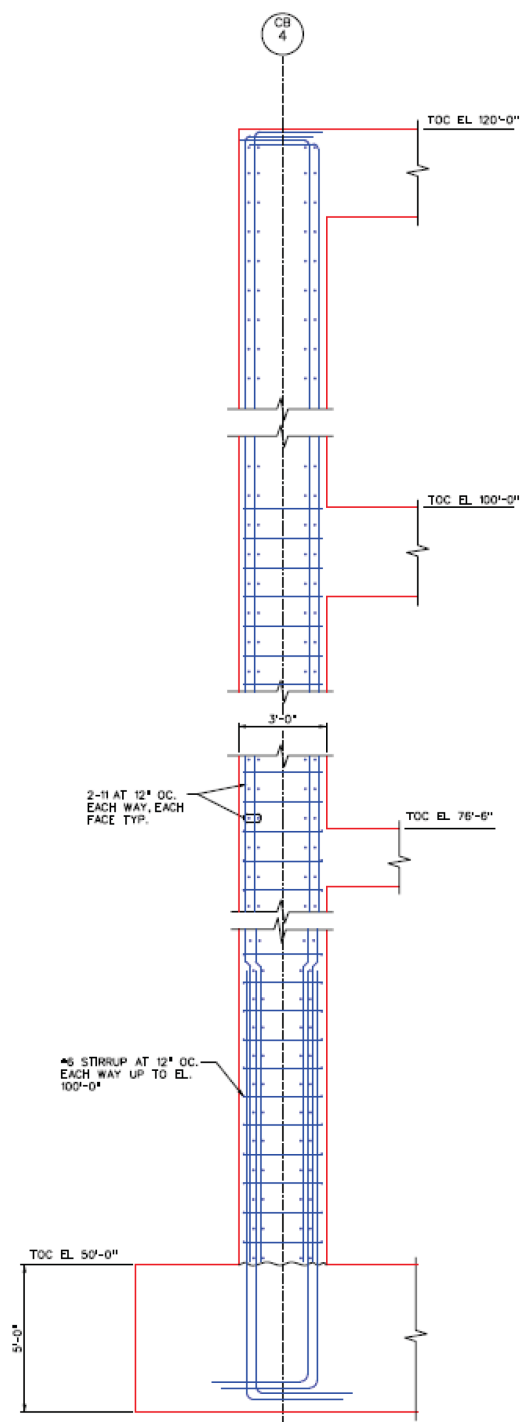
B-70: CRB Reinforcement Section View of Wall on Grid Line 4
